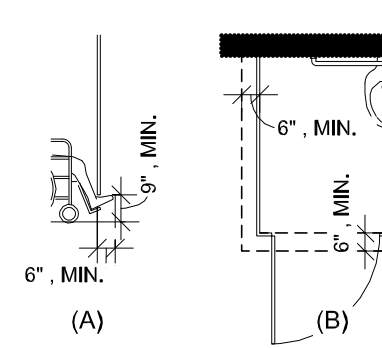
TOILET COMPARTMENT TOE CLEARANCE (A) ELEVATION (B) PLAN
